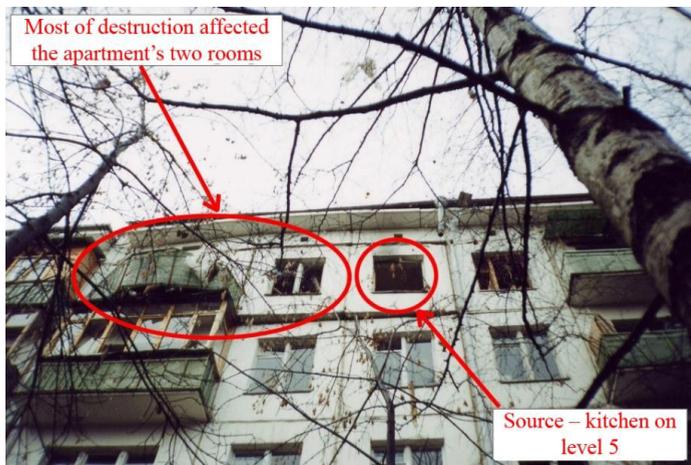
Photo of explosion impact from methane-air mix in a two-bedroom apartment on the 5th level of a 5-story residential building
